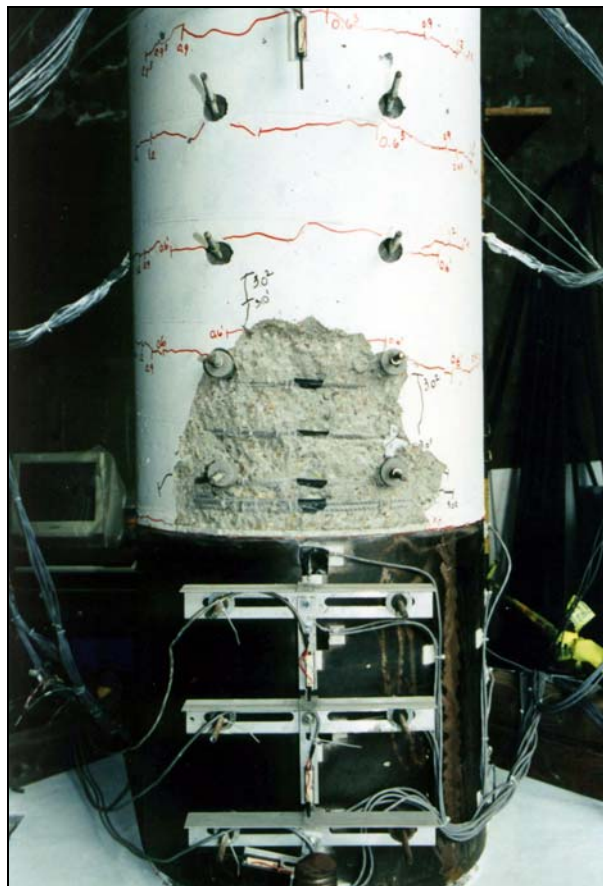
JH1 – Test 1 Spalled region above jacket at test end
